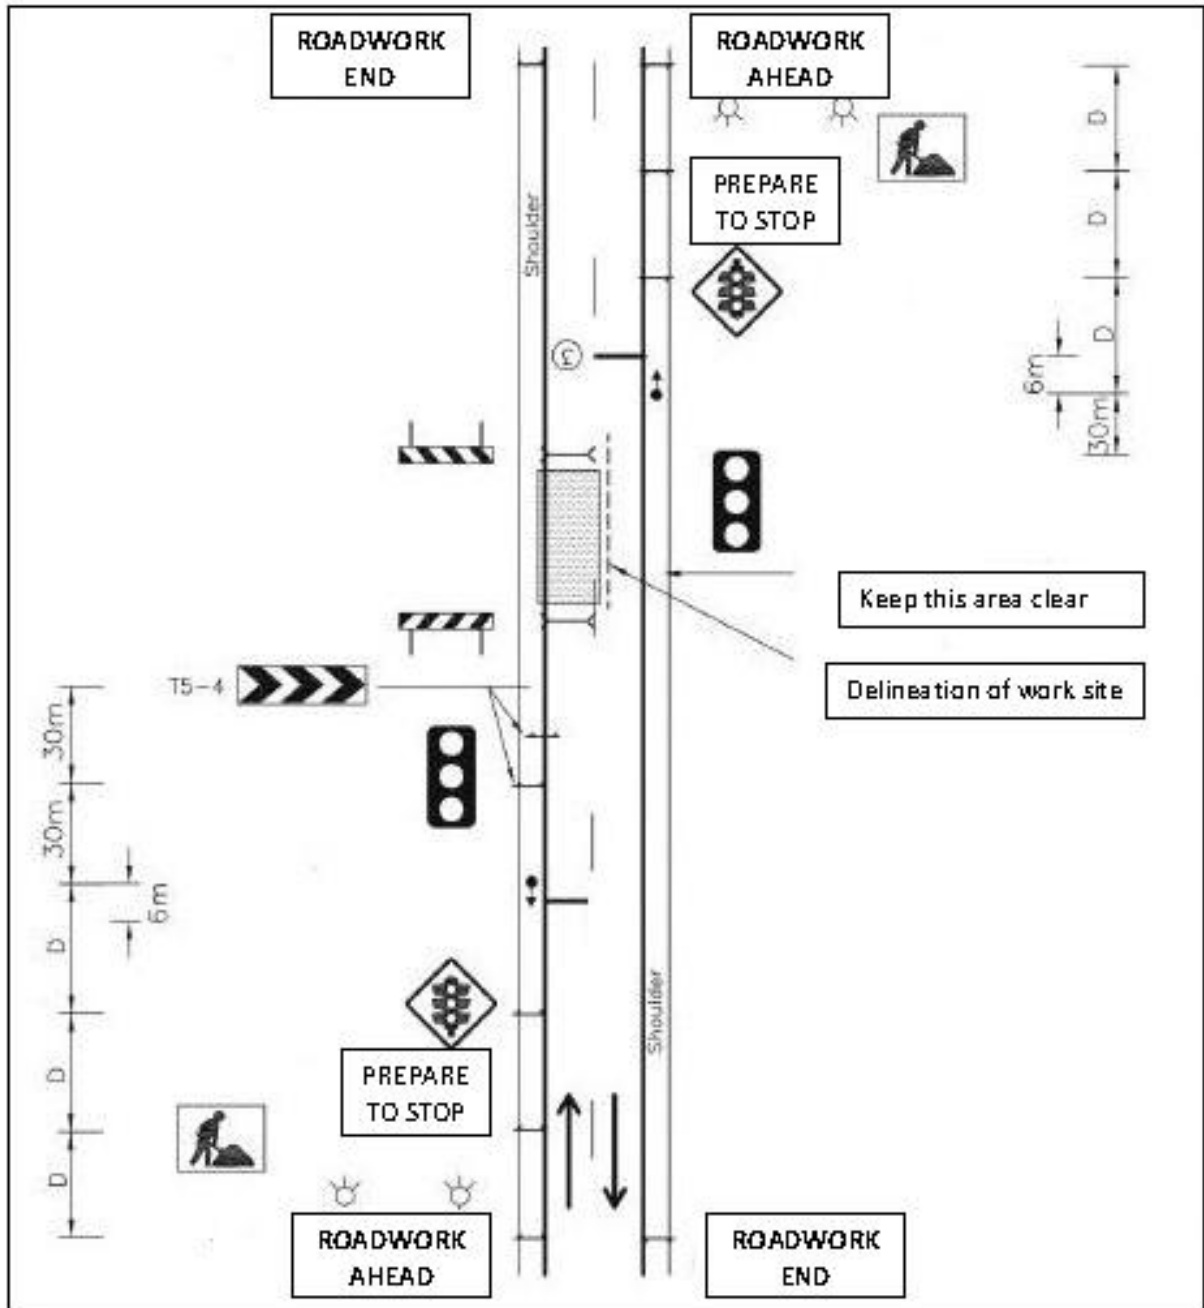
Specimen layout design for traffic signs at a work site occupying half of the carriageway
